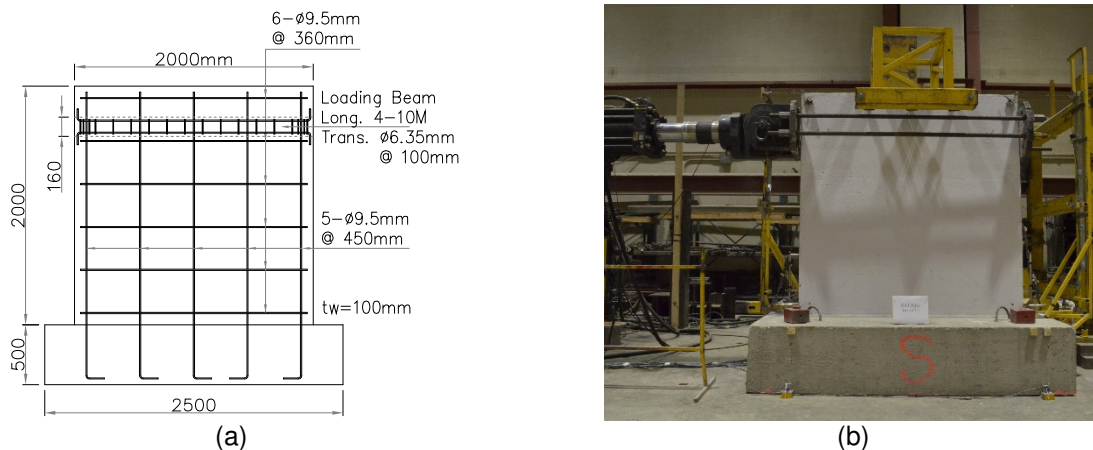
Wall Specimens: (a) Reinforcement Layout; and (b) Testing Setup
